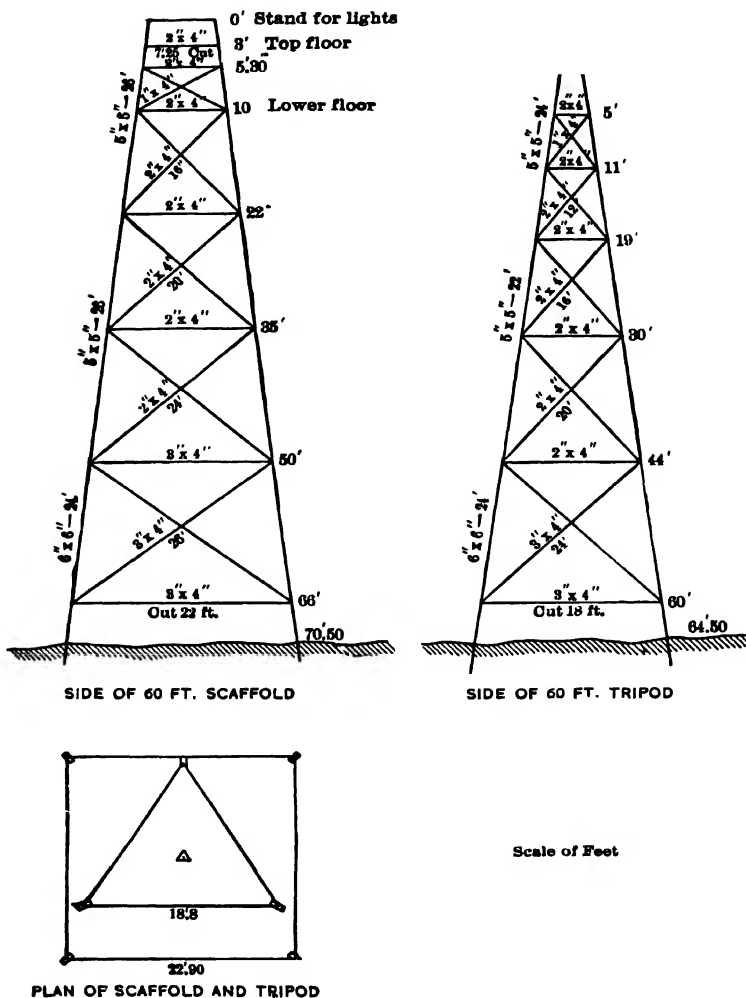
Framing Plan of 60-foot Wooden Tower. (*Coast and Geodetic Survey.*)
